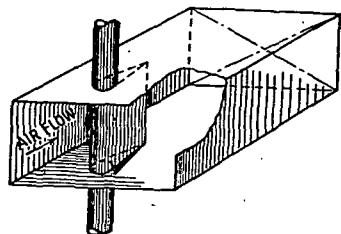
INSTALLATION OF EASEMENT IN DUCT AROUND OBSTRUCTION
